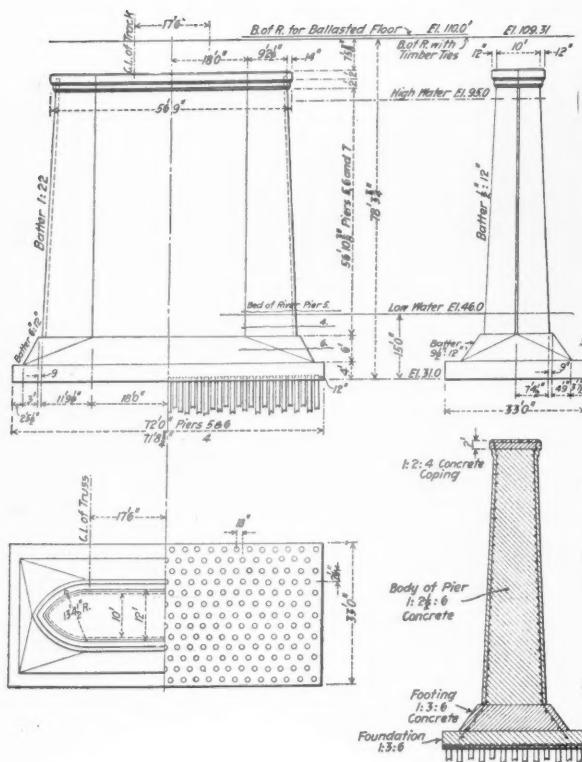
Details of Piers Nos. 4, 5 and 6.
